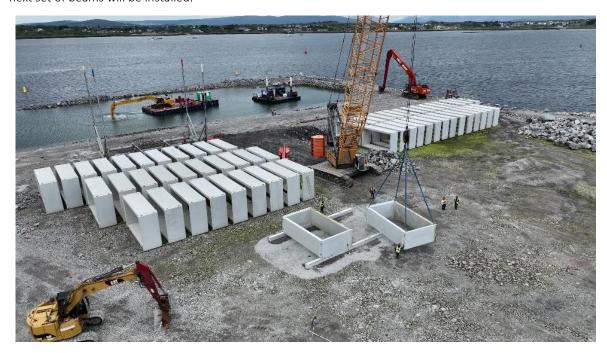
Photography of the (7m x 4mx 2m) concrete caisson boxes being positioned on precast concrete foundation beams positioned on the ground during a field trial on land.
